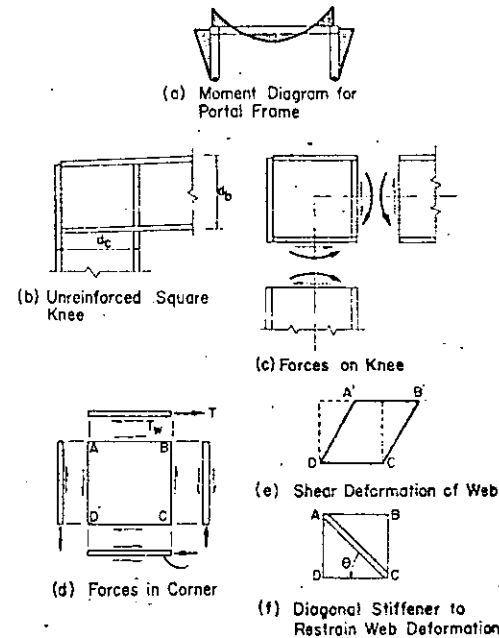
STRAIGHT CORNER CONNECTIONS
